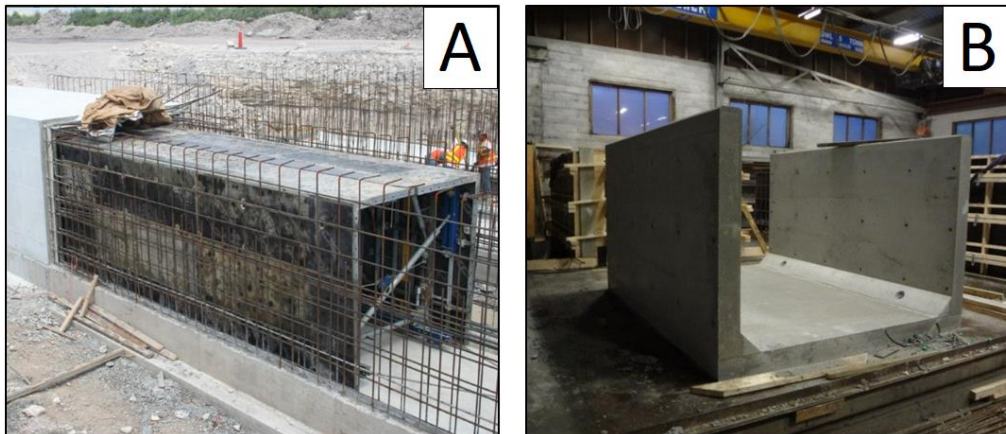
Principles of constructing a culvert with method A) cast-in-place at construction site, and B) pre-cast at a factory in elements (Source: [www.doka.com](http://www.doka.com) and [www.aakrasement.no](http://www.aakrasement.no))
